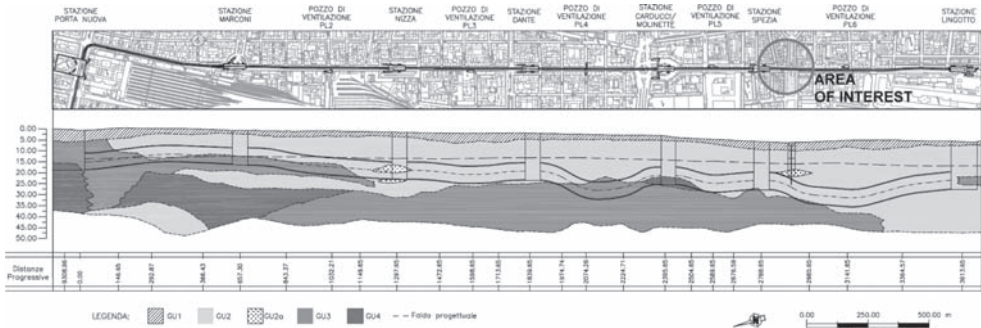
Plan view and geological longitudinal cross section of the Porta Nuova–Lingotto extension.
